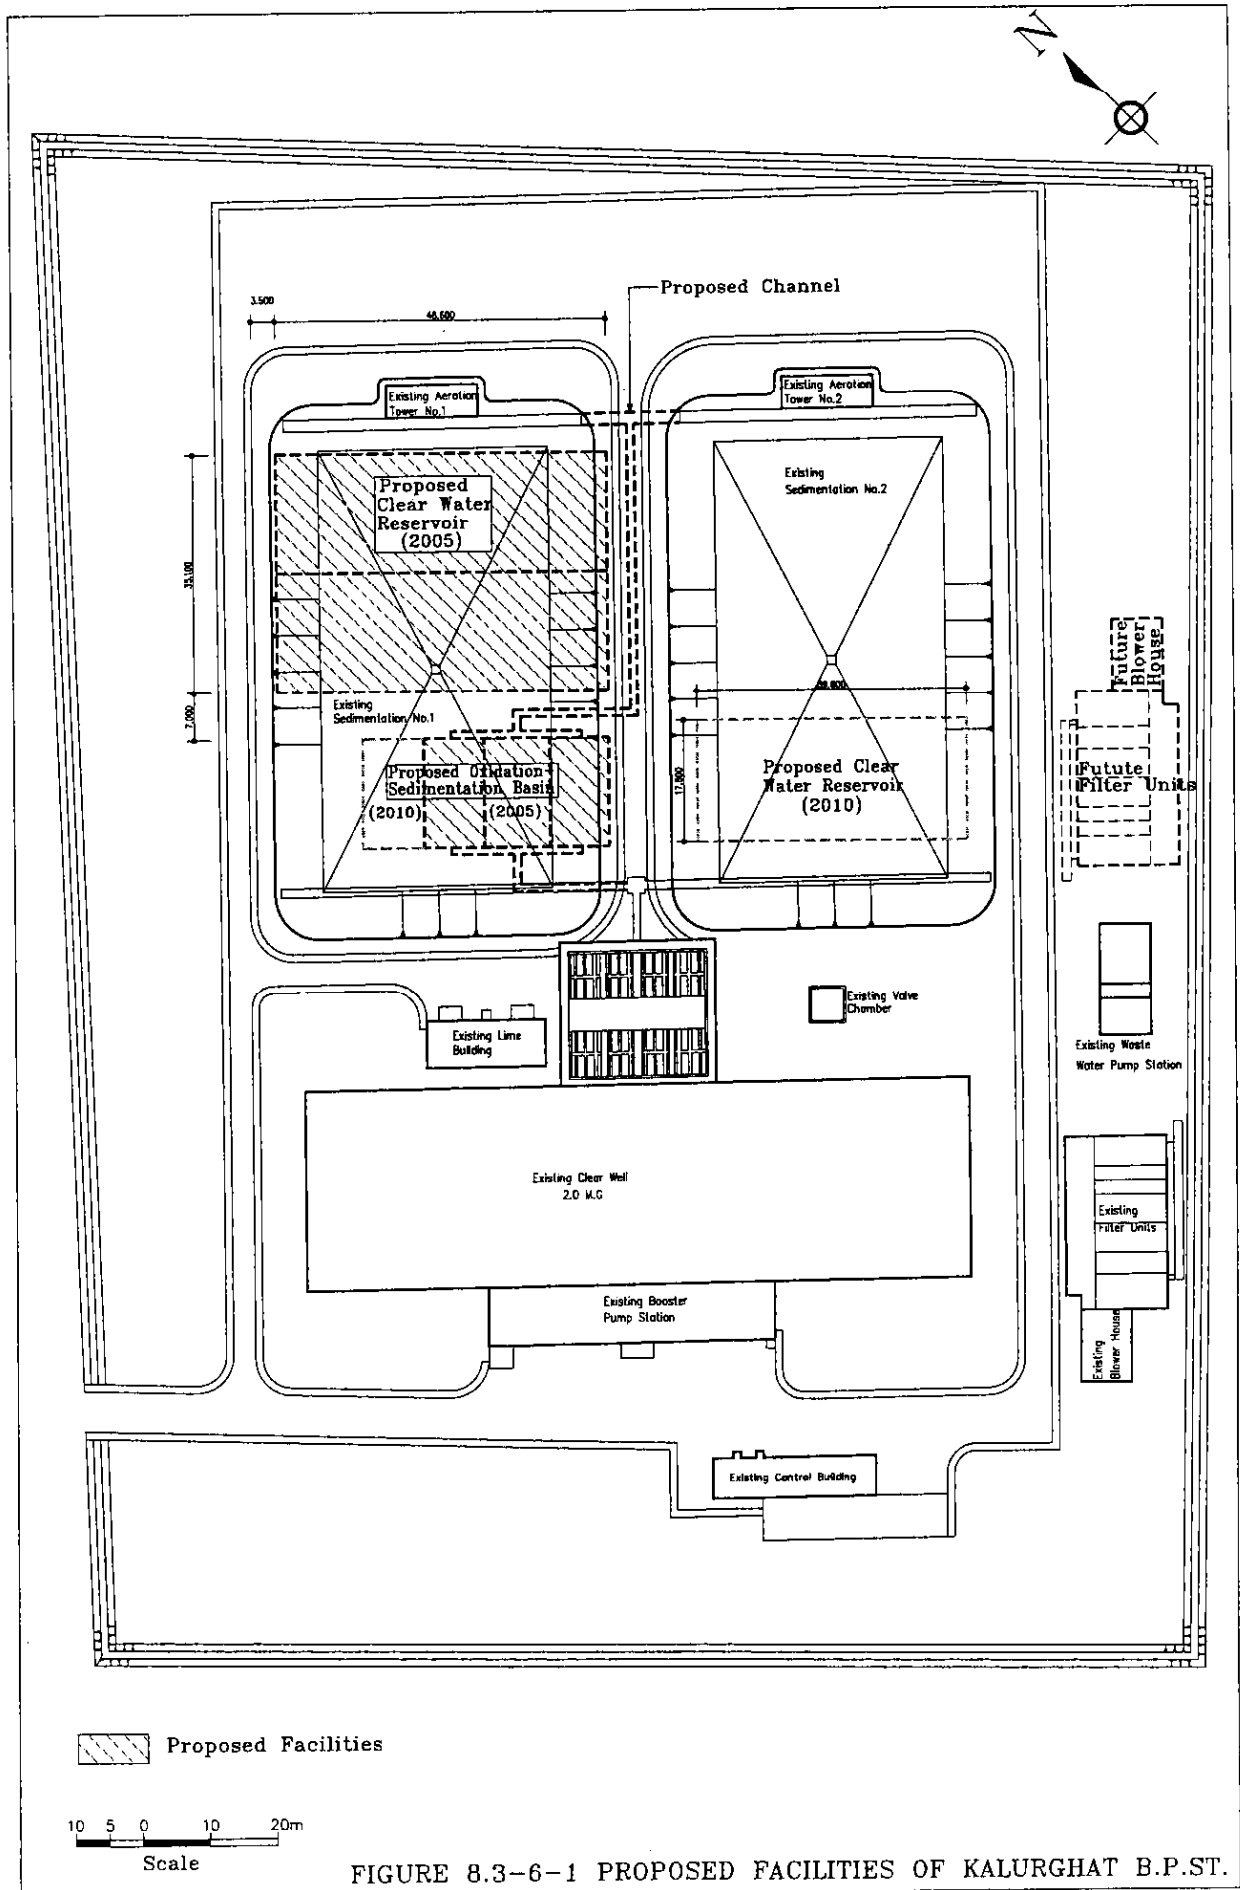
PROPOSED FACILITIES OF KALURGHAT B.P.ST.
